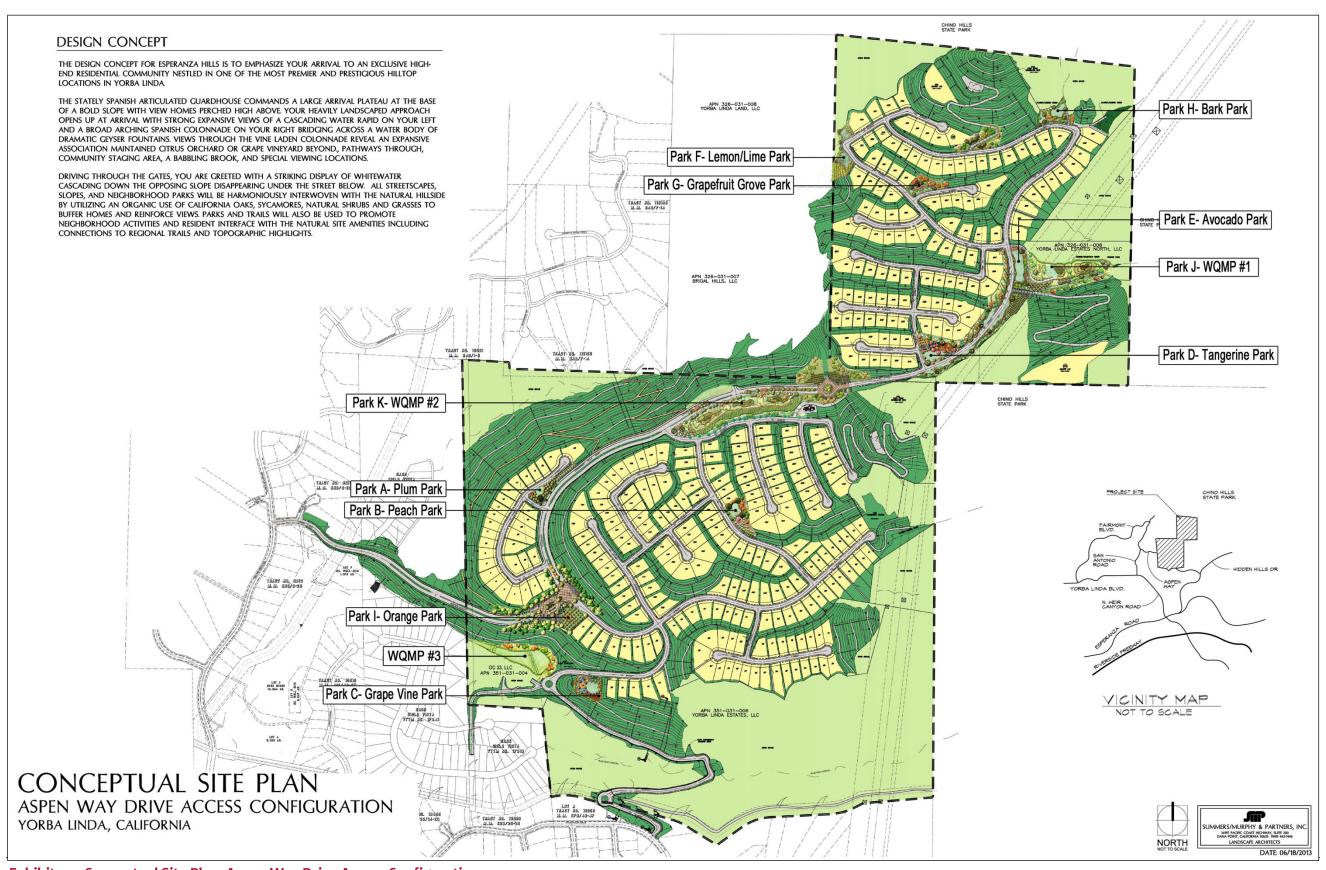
Conceptual Site Plan, Aspen Way Drive Access Configuration
